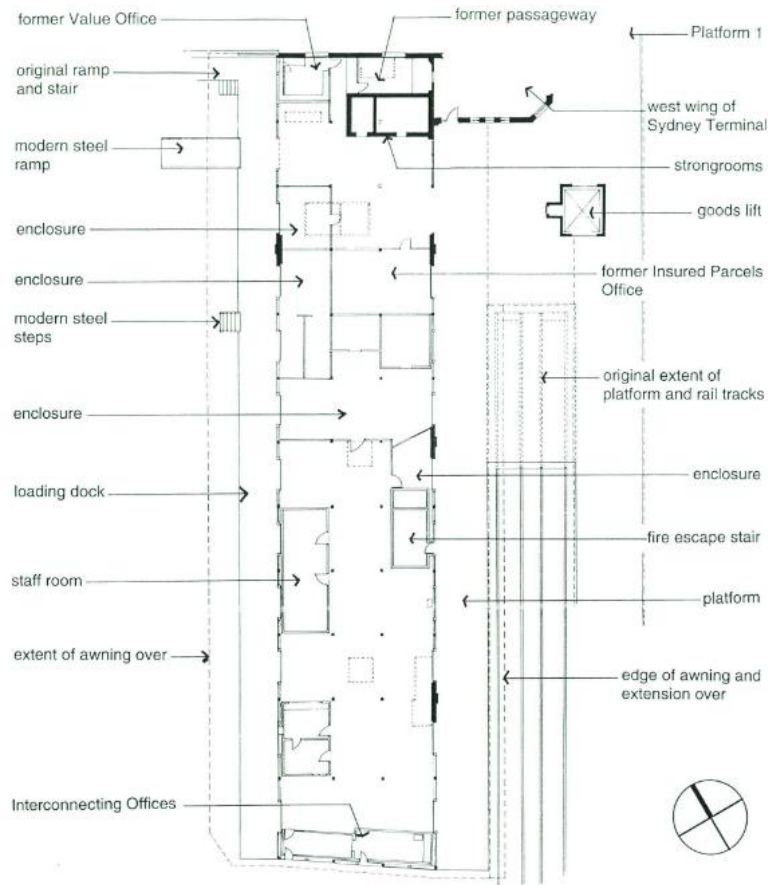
Existing Floor Plan of Inwards Parcel Shed, Sydney Terminal¹
